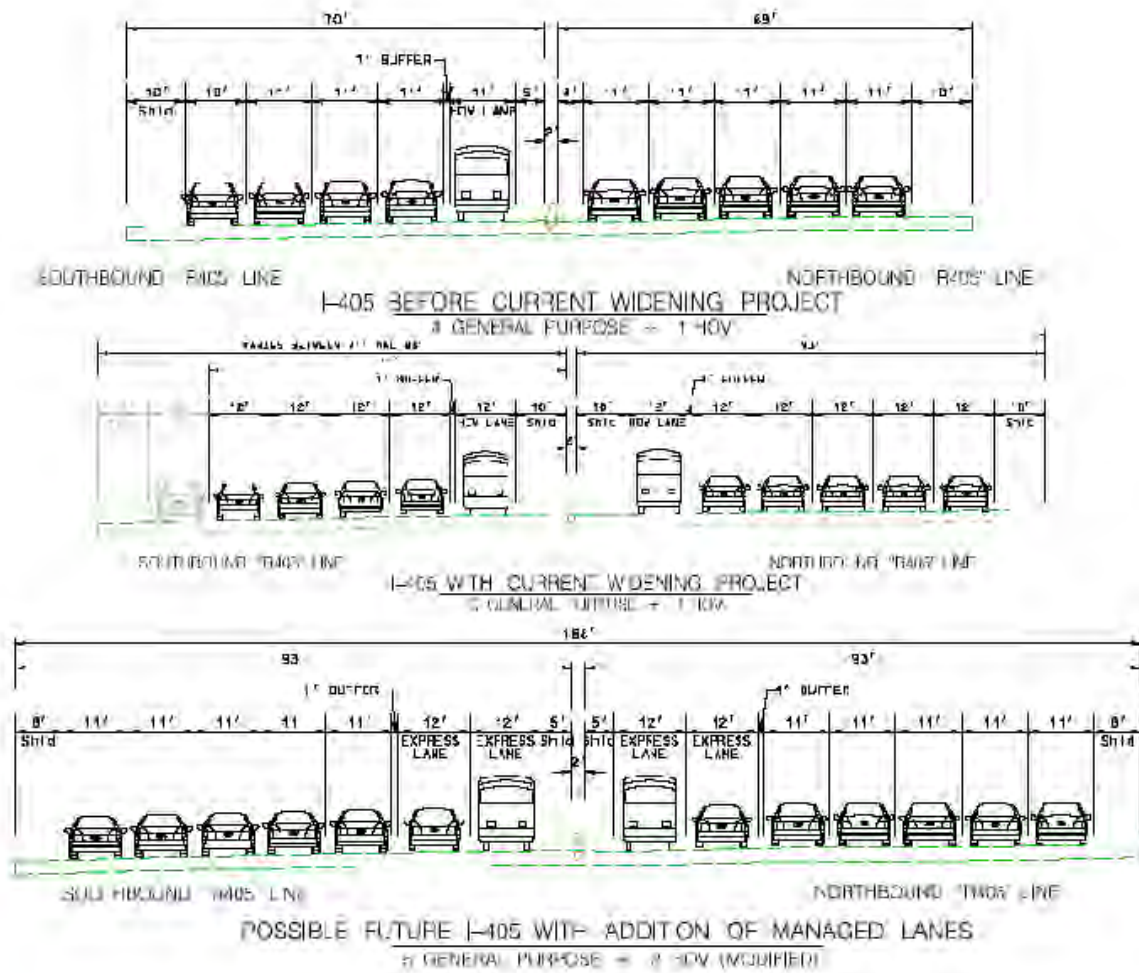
illustrates three current cross sections within the Sepulveda Pass as well as the future changes that are currently being implemented or could be possible with Concept 2.
